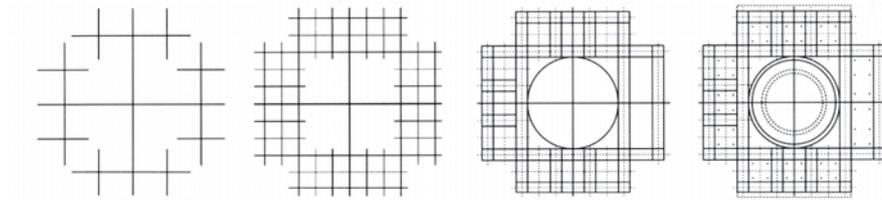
Steps of a top-down design process in which a layout of a ground floor is successively refined into a detail component design plan (from Durand 1802)
